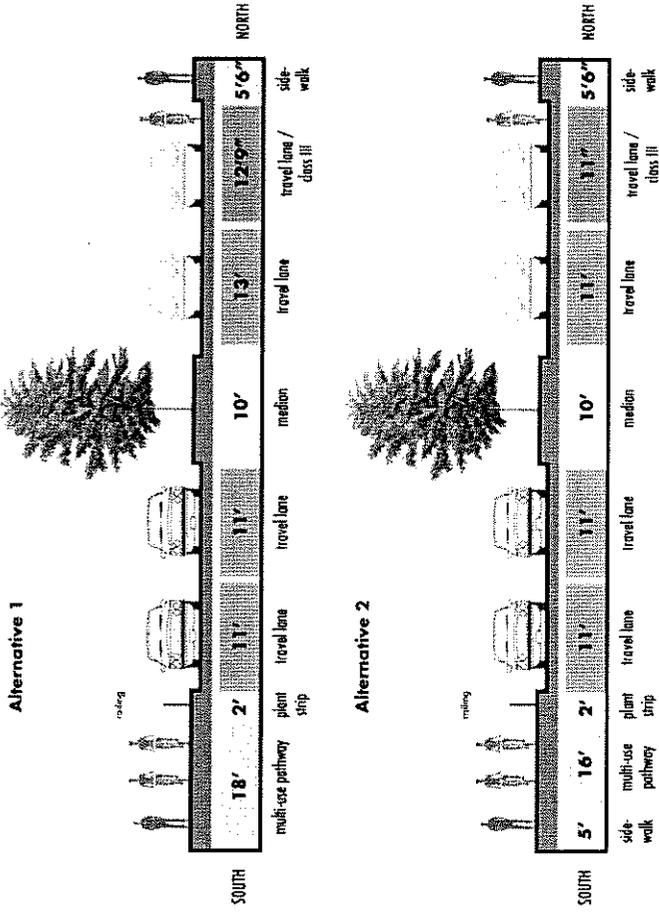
Section of Proposed Improvements for Project 12: Second Street (Section A: East Street to Ida Street) (Medium-Term Improvement)
